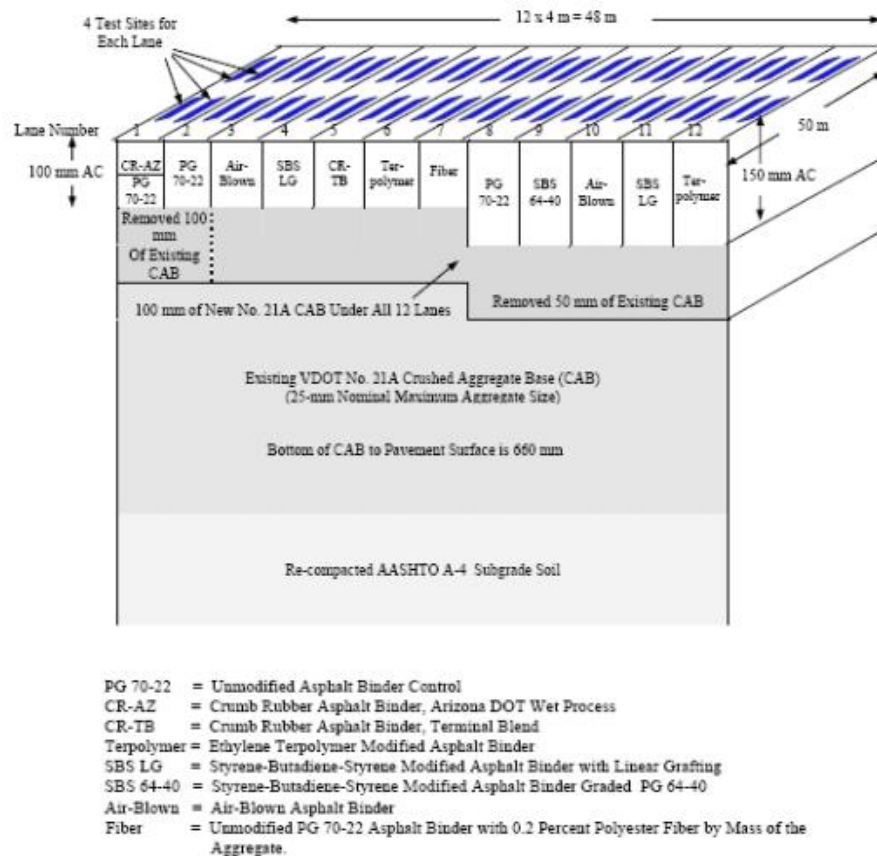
Pavement structures for the 12 full-scale test lanes [57]
